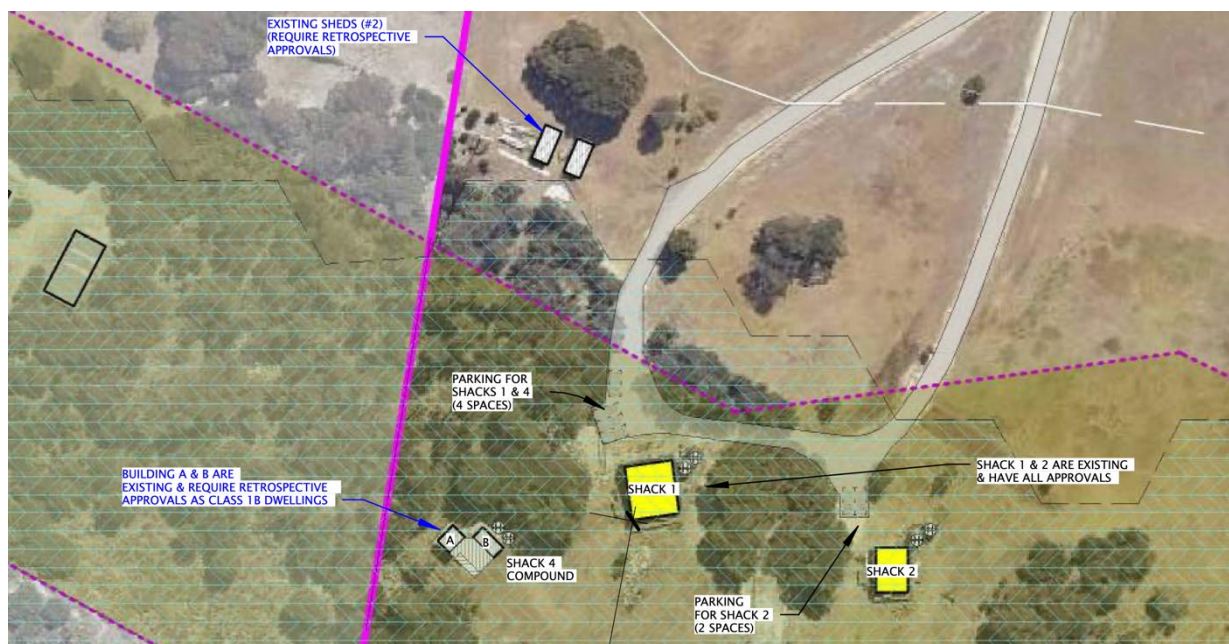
Existing site plan detail showing buildings that require retrospective approval – blue text blue arrows.
